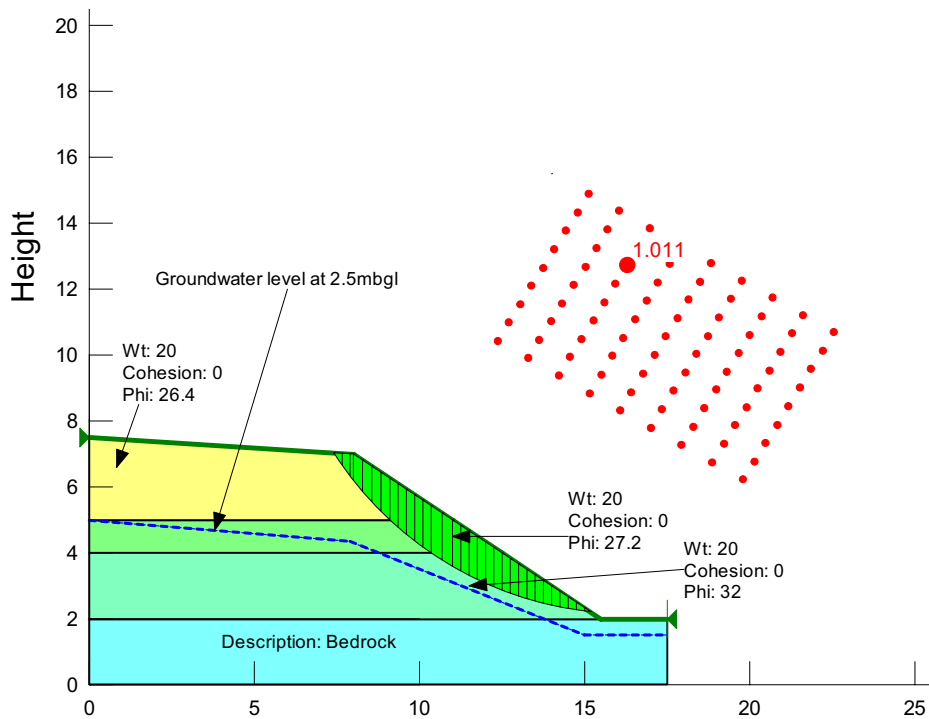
Slope Stability Analysis for Open Cut Excavation (drained)
